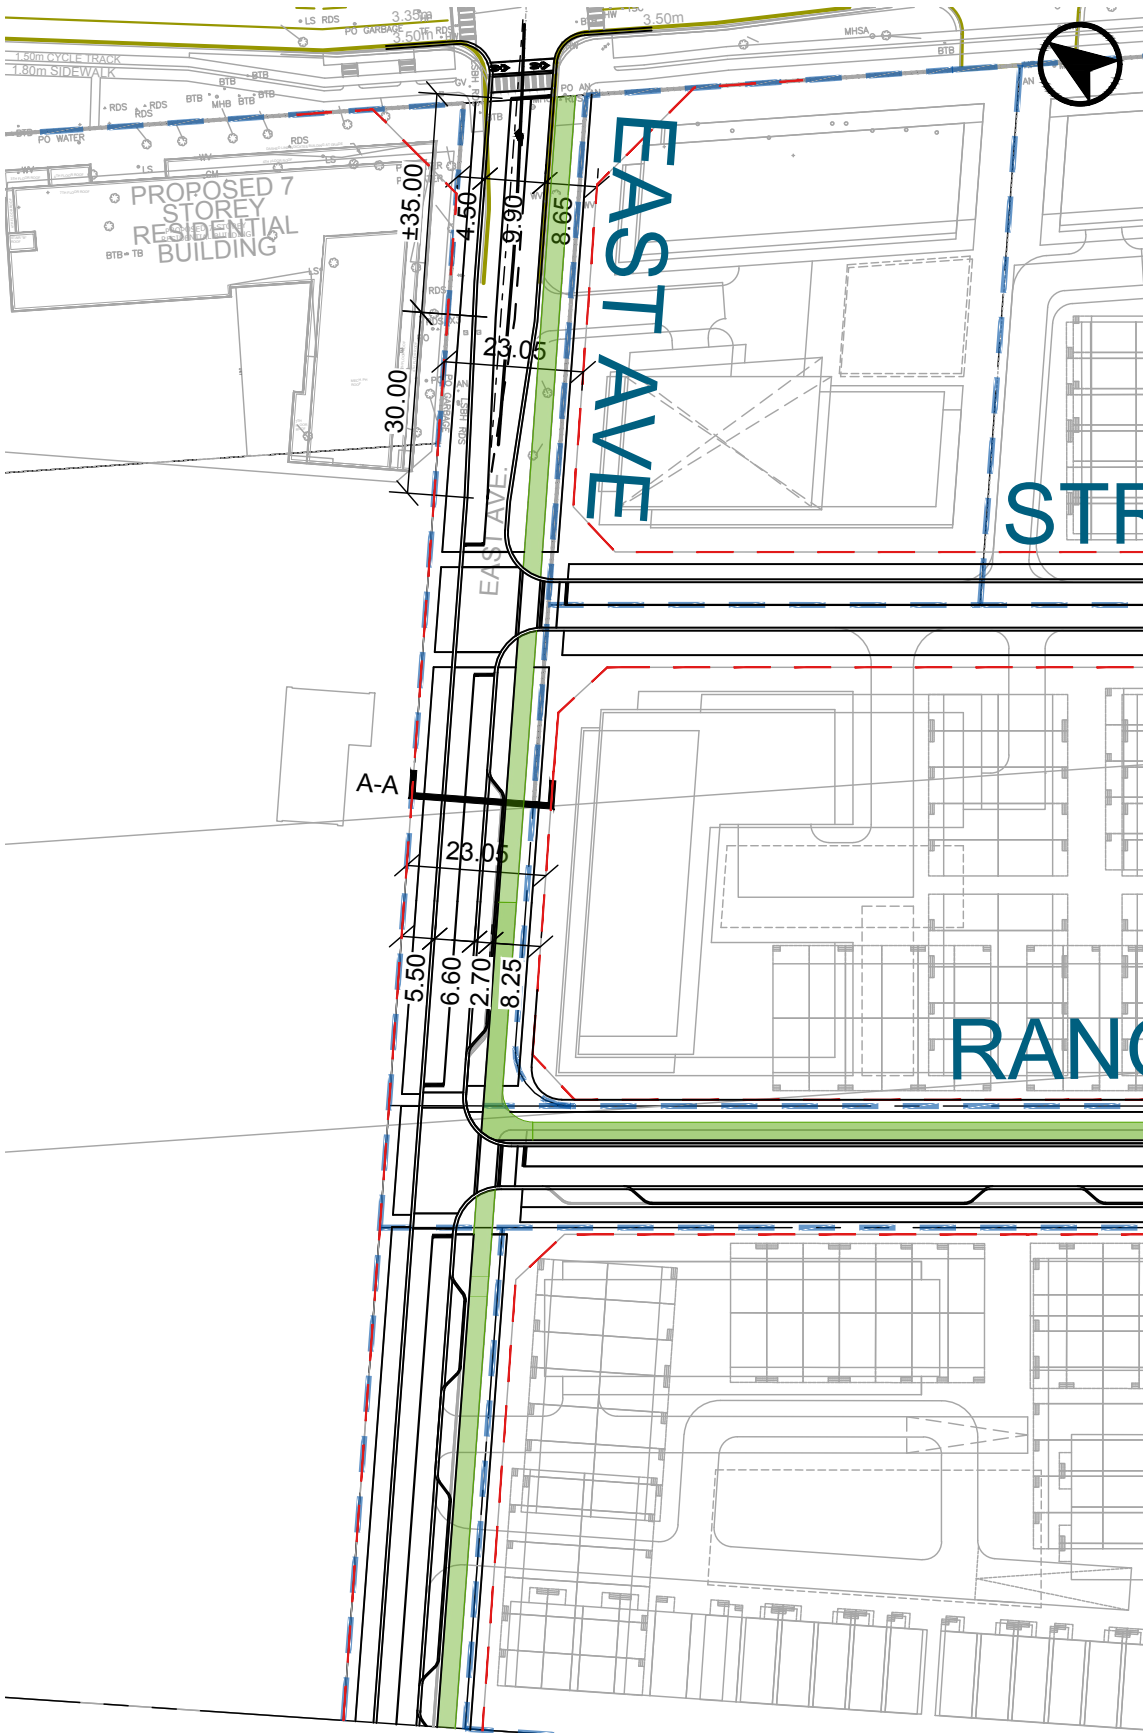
EAST AVENUE - FUNCTIONAL PLAN & CROSS-SECTIONS
